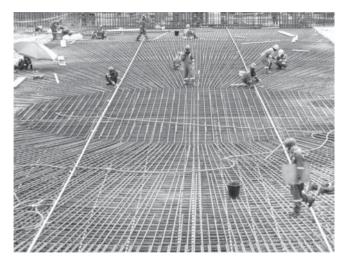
Orthogonal reinforcement layout in middle of base slab.
